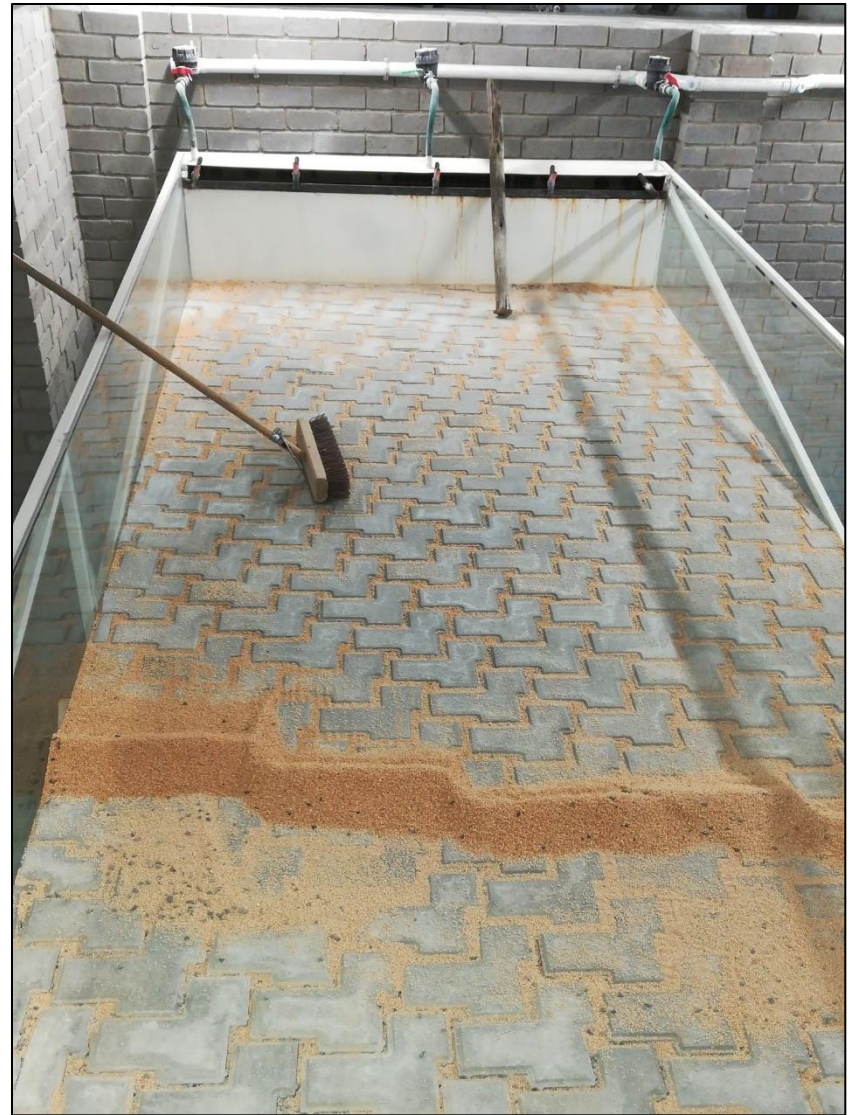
An image of P-Type 1 jointing material being added to a Waterwise®-containing layer works in the Model Design Testing
